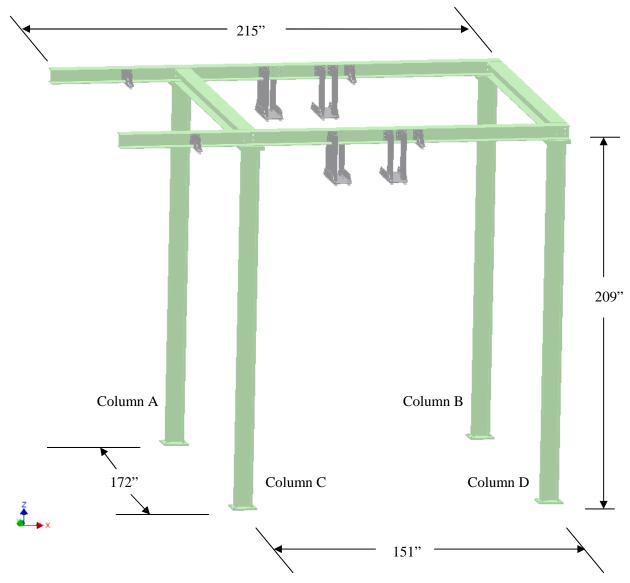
E906 Station 3 &4 Support Frame structural members (shown in light green) are AISC size W8x31 wide-flange I-beams. The drop connectors (shown in gray) connect the detectors to the structure.
